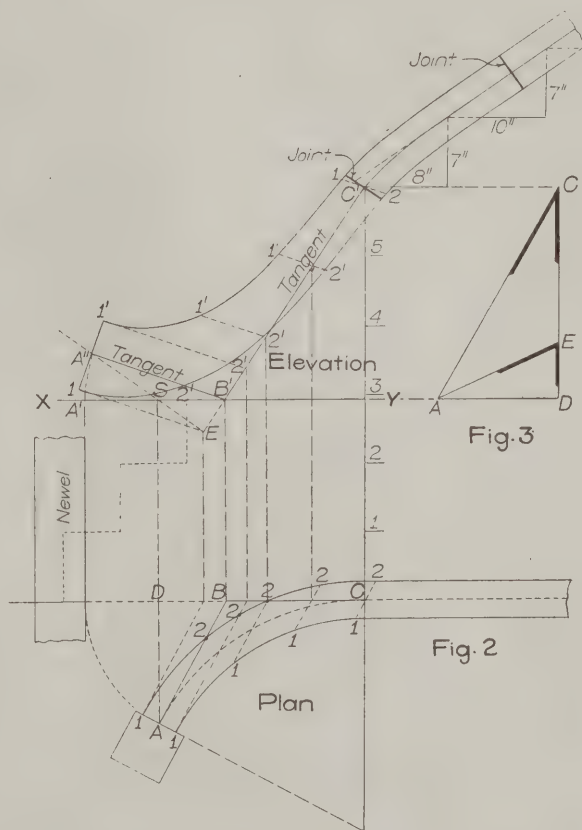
Plan, Elevation, Pitch of Tangents, etc., of Same Rail
